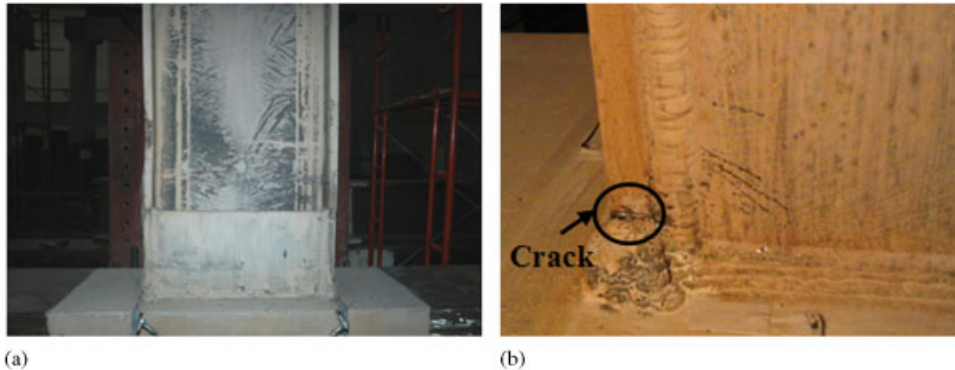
Specimen SP2 beam and side plate yielding during the first test to a 4.4% drift: (a) beam yielding and buckling and (b) side plate yielding and beam flange crack.
